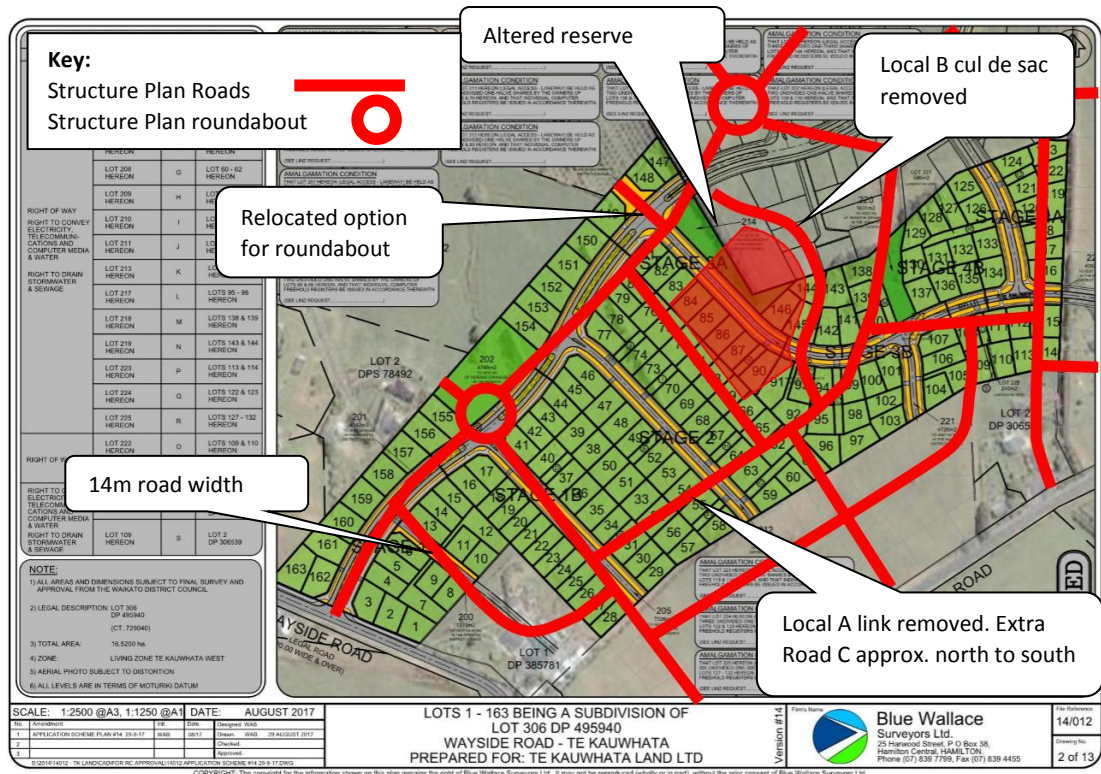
Structure Plan Road Layout Overlaid on Proposal (Approx.)
